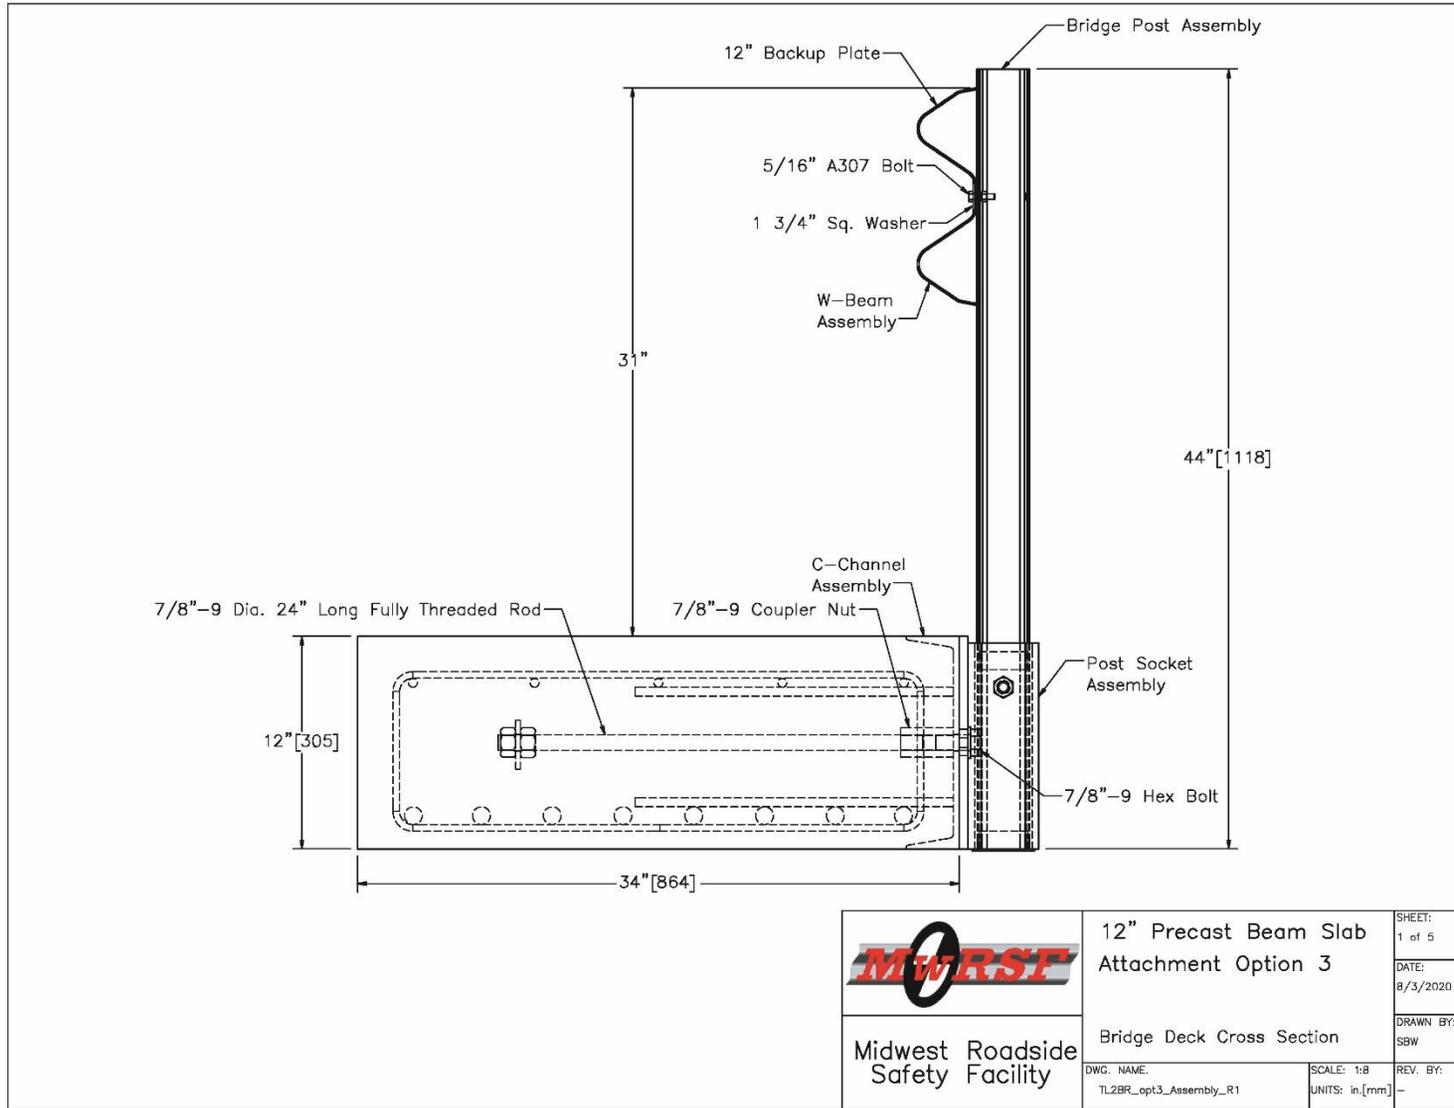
System Details, TL-2 Bridge Rail Attachment to 12-in. Deck, Option 3, Cross Section
